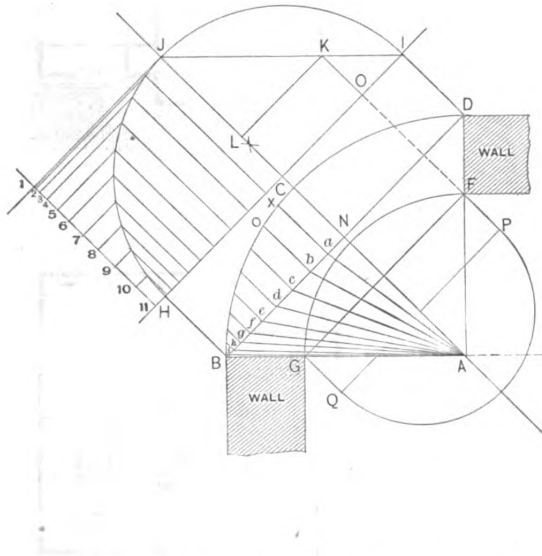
Plan of Wall Opening and the Elevation of the Arch.
